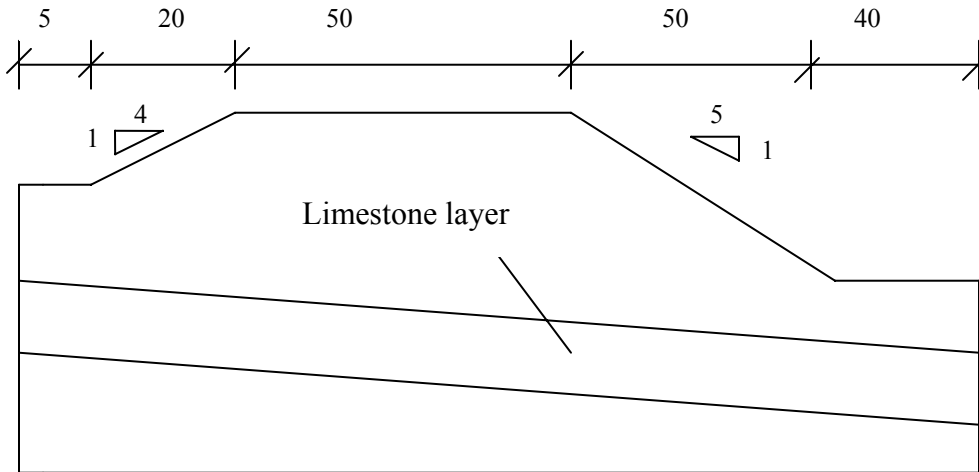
Austin Loop 1 Pavement Cross Section Sketch.
